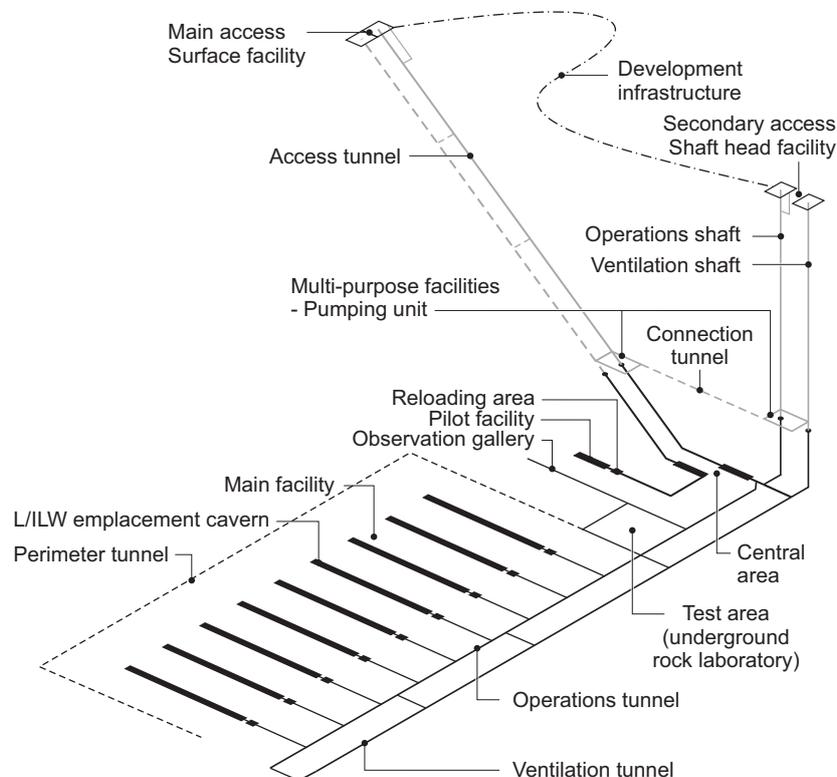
Schematic plan-view layout of a generic concept for a L/ILW repository.
